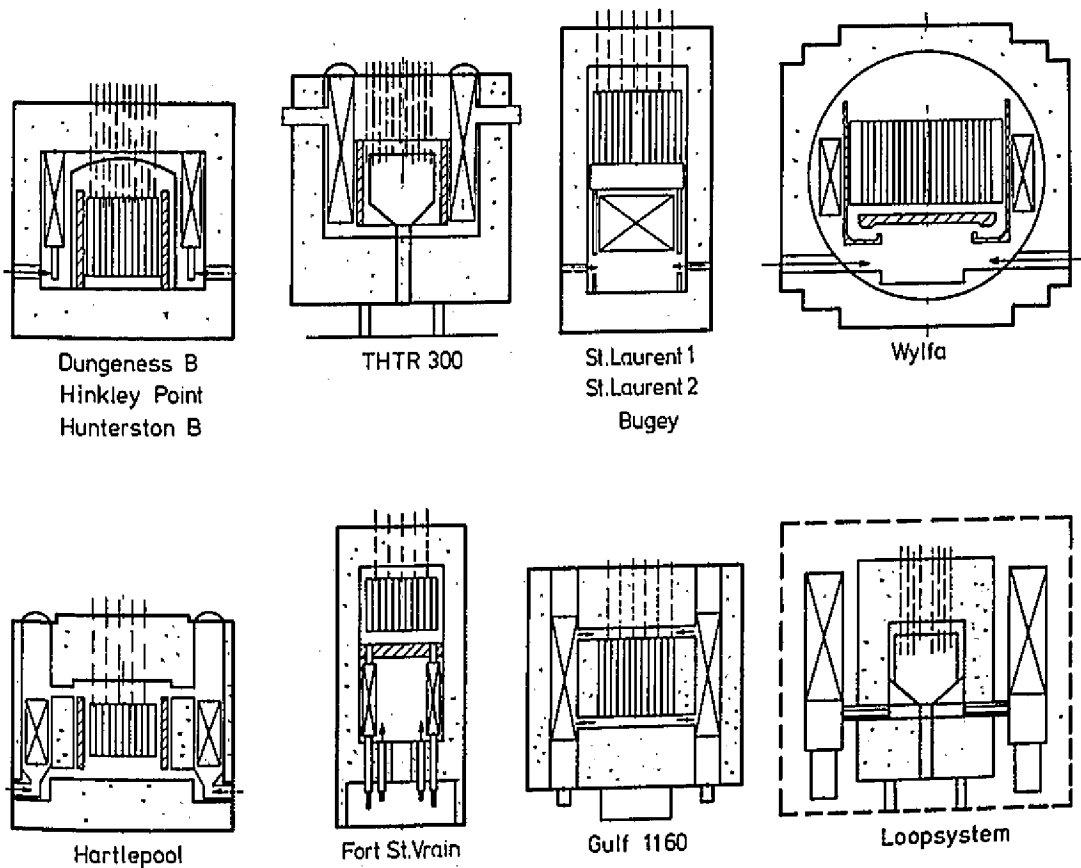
Designs of Prestressed Concrete Vessels (already constructed as well as planned plants)
